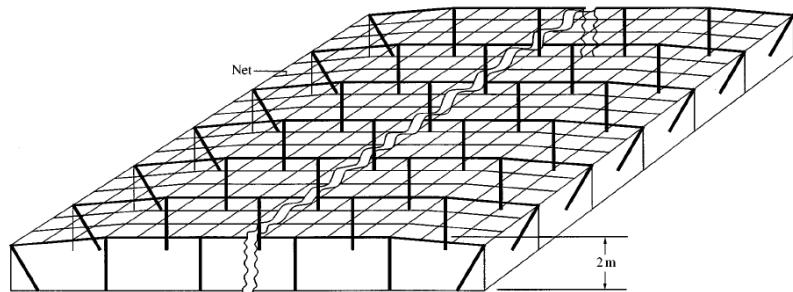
Typical structure of the 'Parral-type' greenhouse in Almeria (Spain)
